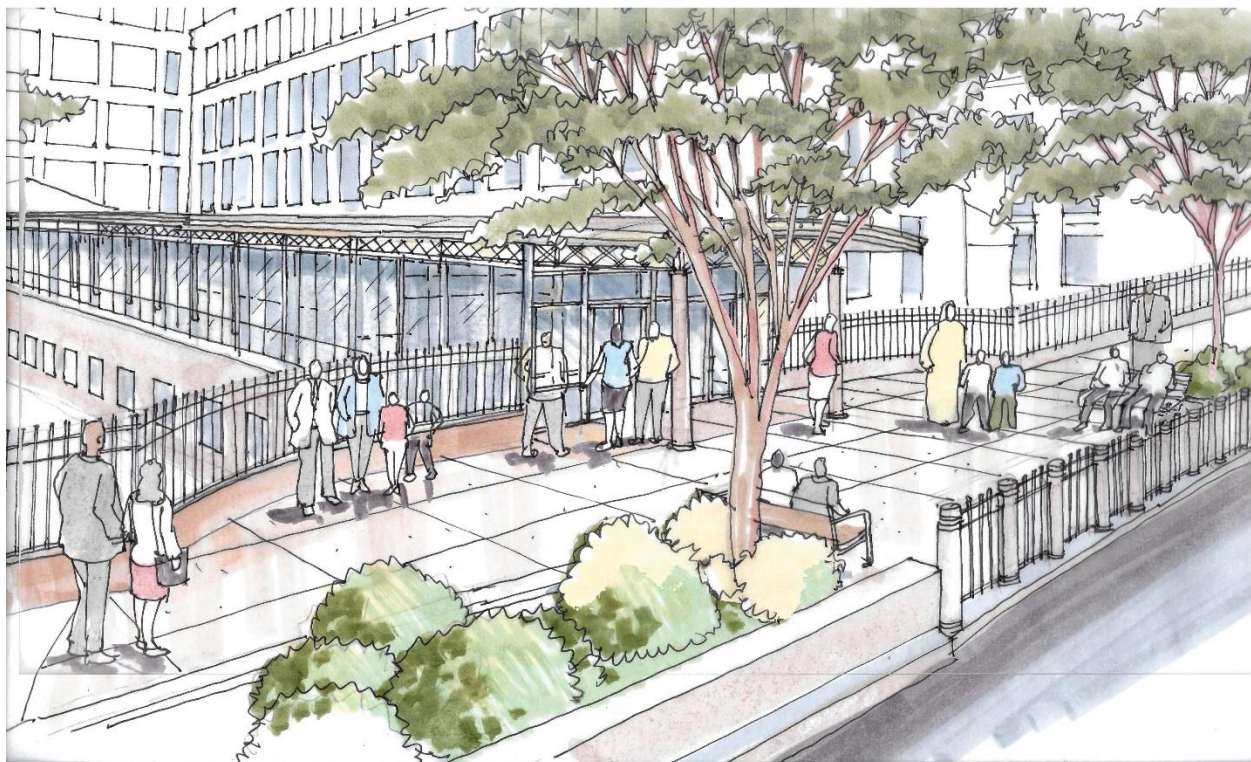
View of proposed entrance bridge improvements from 14th Street, SW
